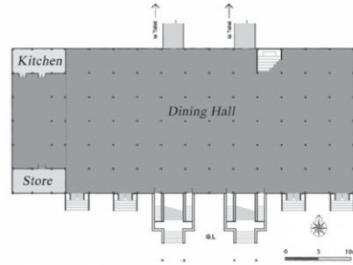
Ground Floor Plan of Bein-Daw Kyaung^{*16}
